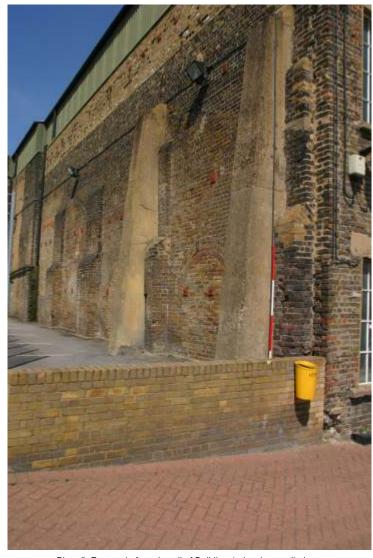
East end of south wall of Building 1 showing applied concrete buttresses over original stepped buttresses
